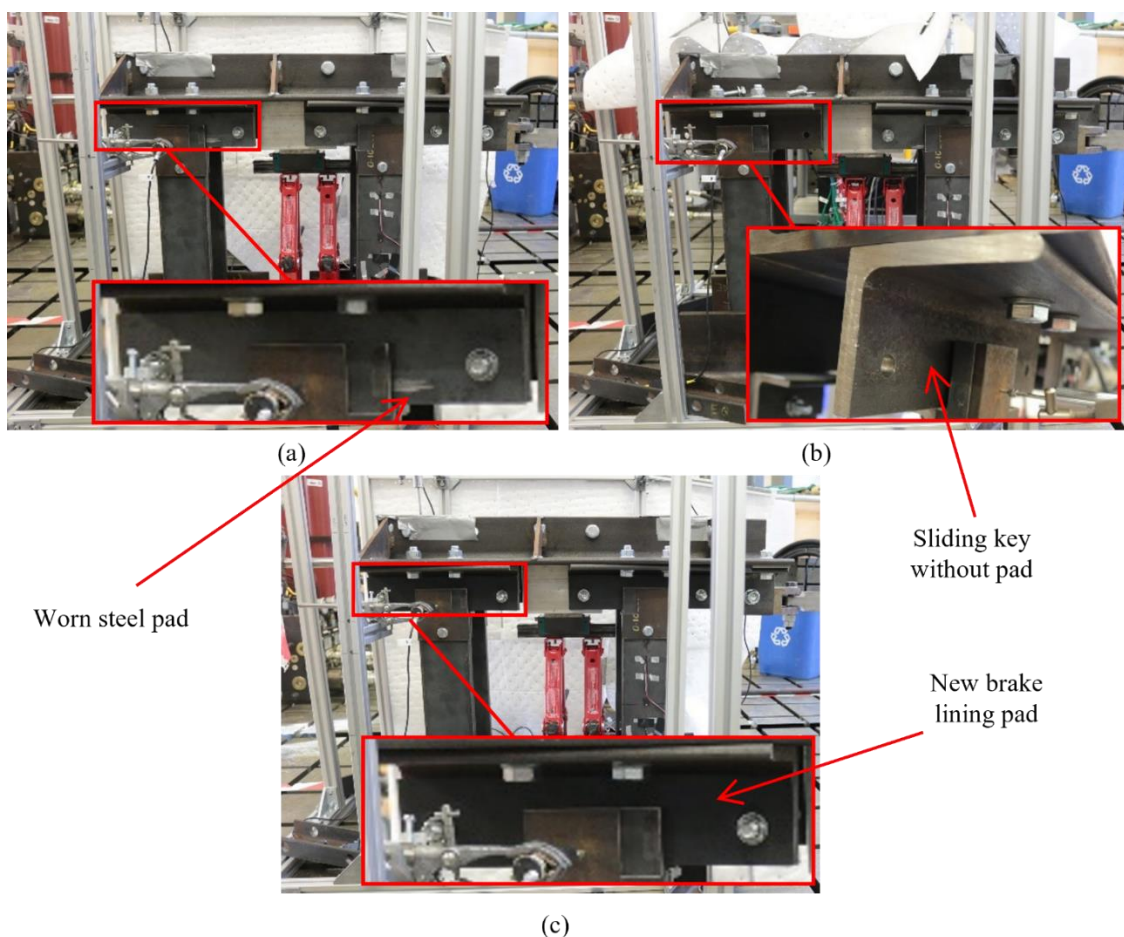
Replacement of friction pads: (a) the specimen with worn steel pads; (b) removing the worn pads and installing new pads; and (c) the specimen with new brake lining pads.
